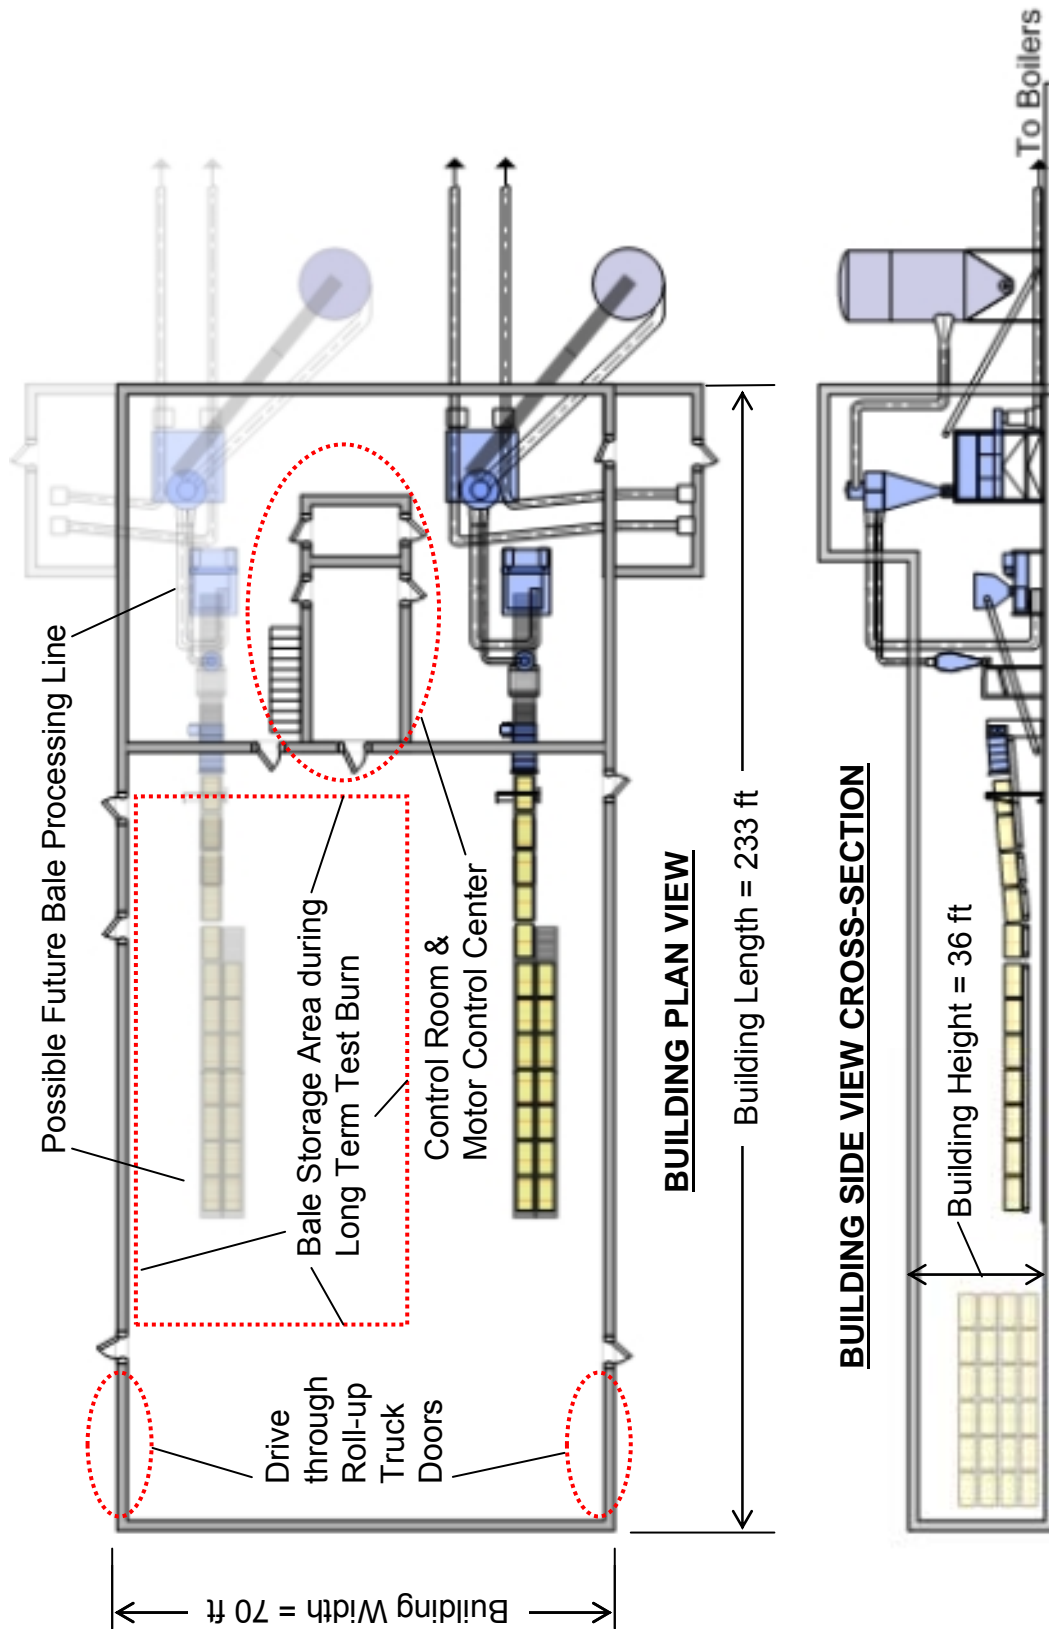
Biomass Processing Building Simplified Layout Drawing
